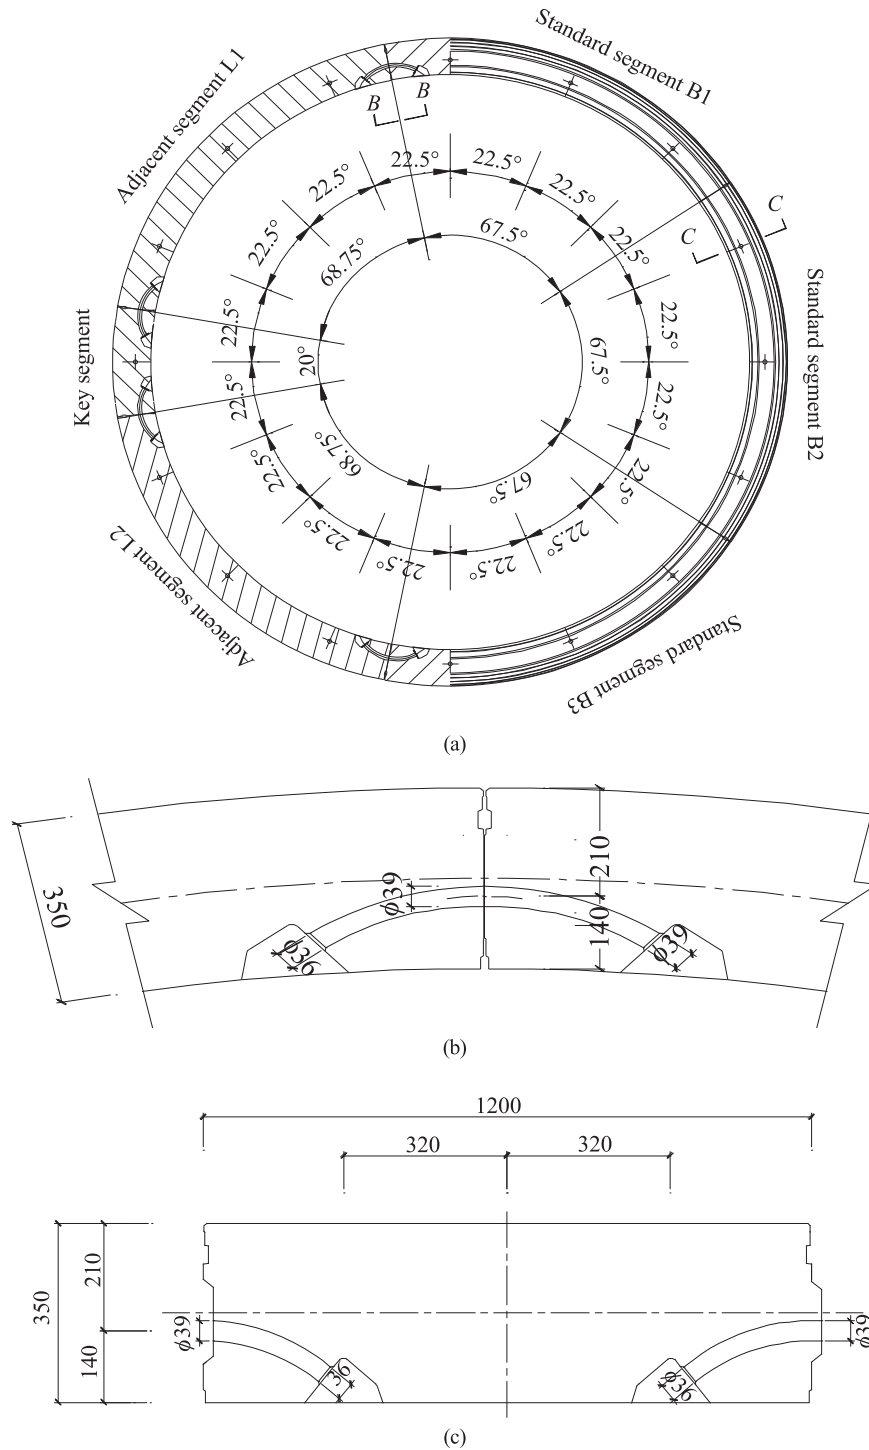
Design details of segmental lining in Fuzhou Metro Line I: (a) general configuration, (b) details of longitudinal joint, and (c) details of circumferential joint (unit: mm).
